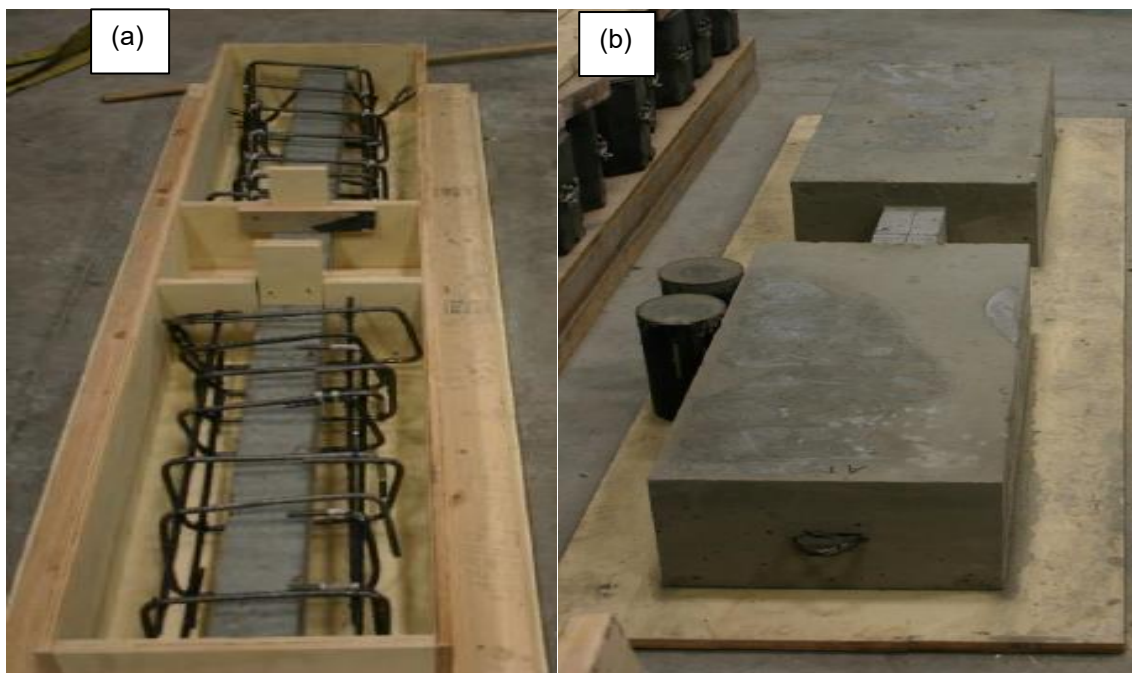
(a) Formwork with reinforcement for casting of sleeper casing blocks (b) Cast concrete block (Scott, 2019)
